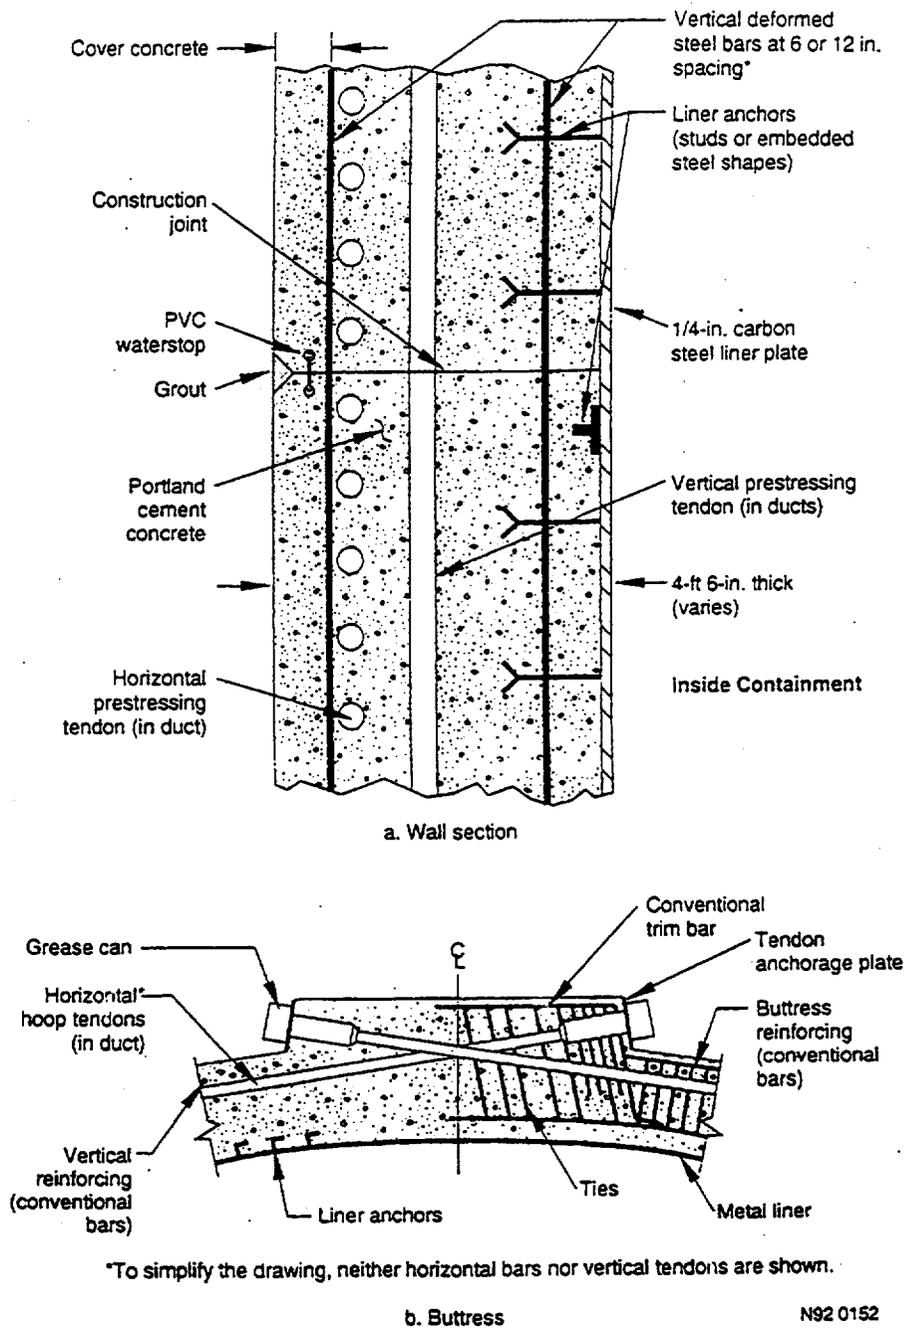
Typical PWR prestressed concrete containment wall section.
